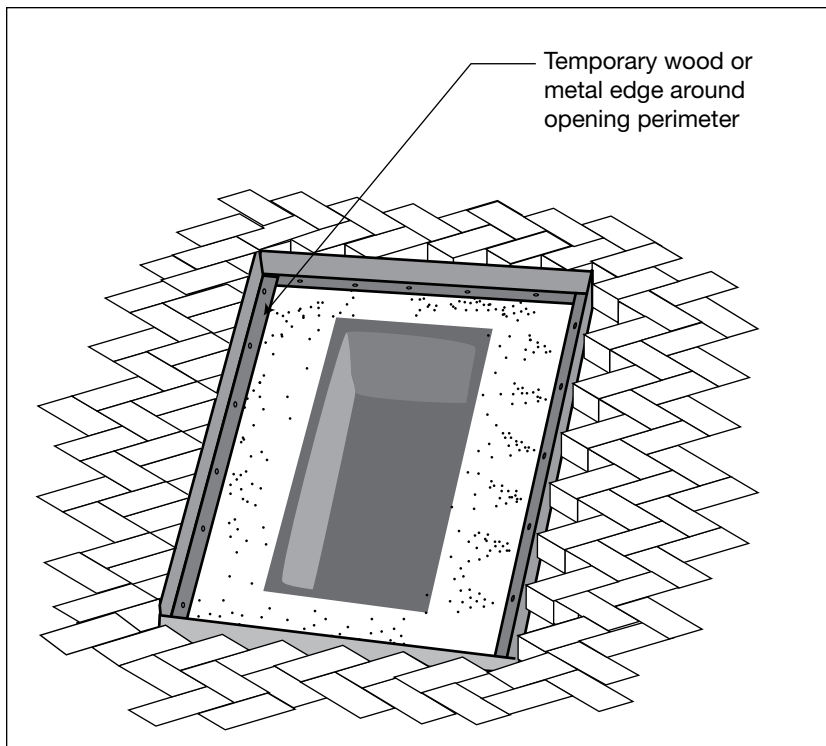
Restraining undisturbed pavers with a wood or metal frame can save time when reinstating concrete pavers.
